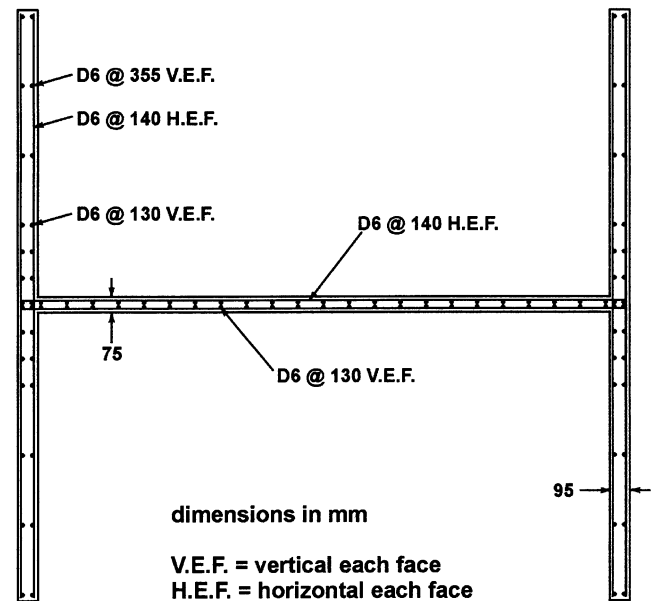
Reinforcement layout of DP walls, taken from Palermo and Vecchio.<sup>18</sup>
